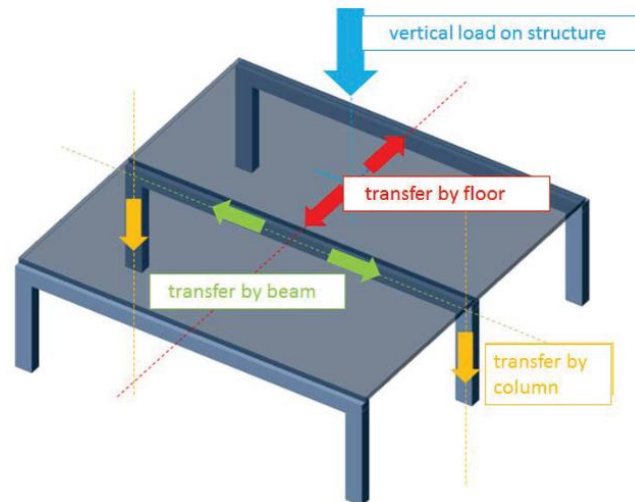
Illustrates the transfer of vertical load by the floor slab and structural frame i.e. column and beams (Cie, 2016)
